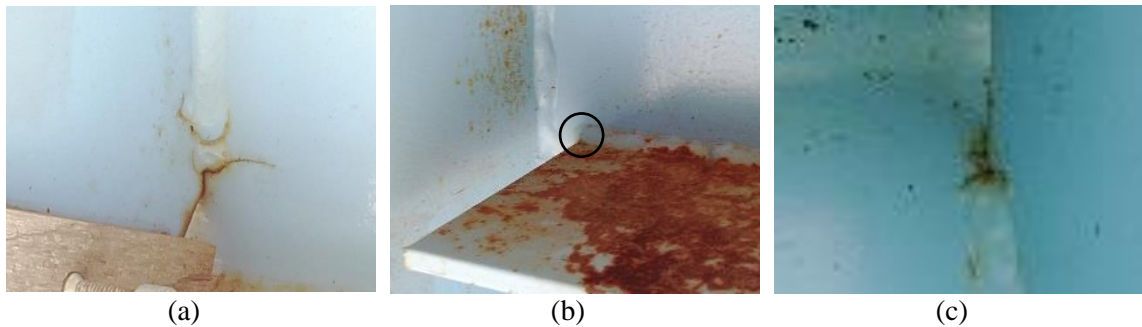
Girder inspection images: (a) true positive (hit), (b) false negative (miss), and (c) false positive
